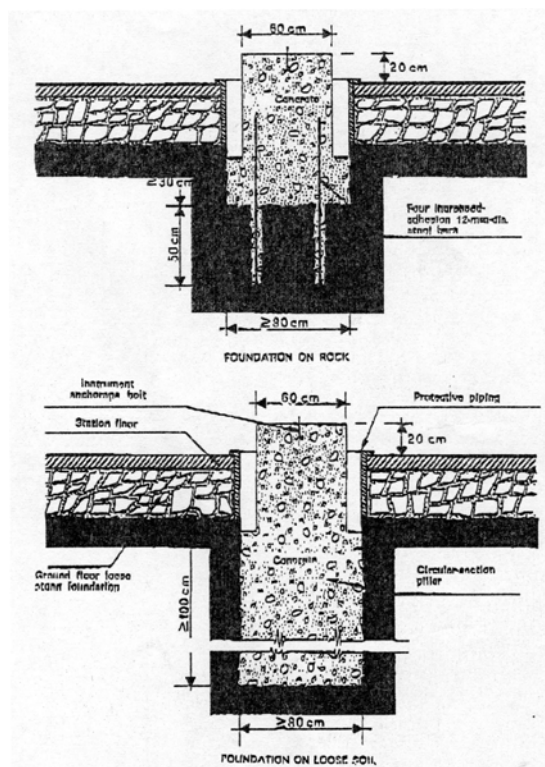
Foundation of the accelerograph anchorage pillar (Berardi et al., 1991).
